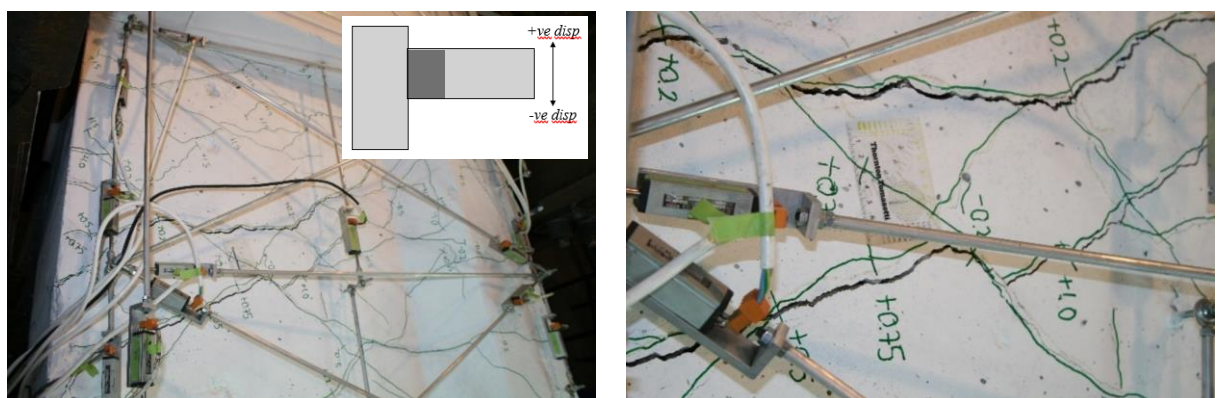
Diagonal cracks developing at 1.5% beam rotation.
